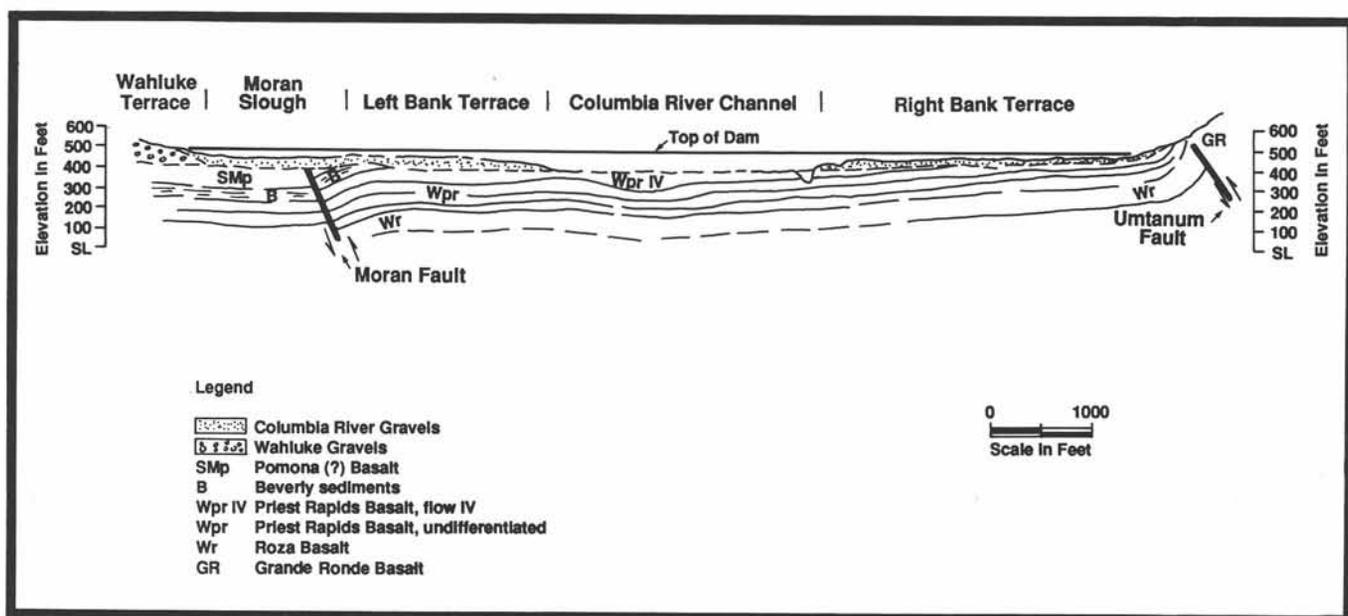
Geologic section at Priest Rapids Dam, view downstream.
